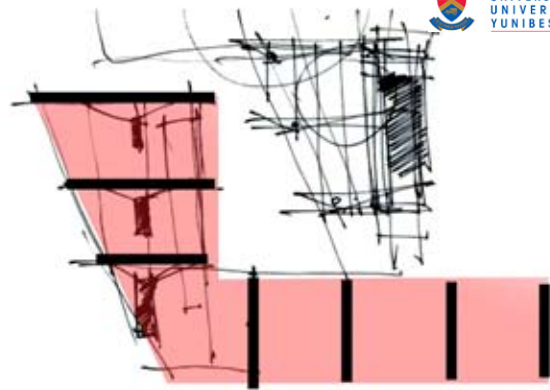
Roof plan diagram indicating initial roof shape responding to both grids
